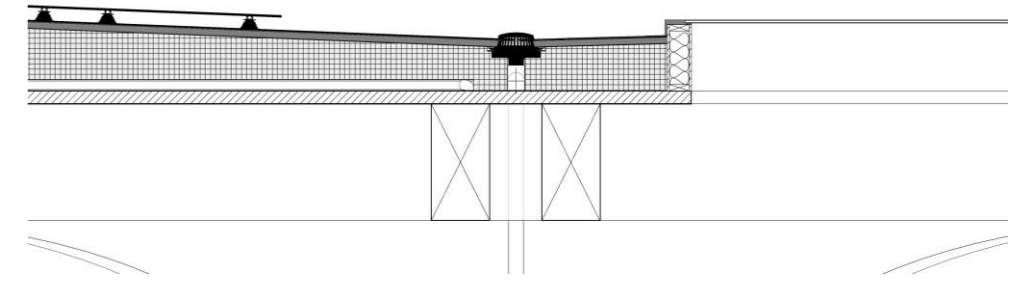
Central Drainage Detail (Reference Appendix B - Detail A2)
